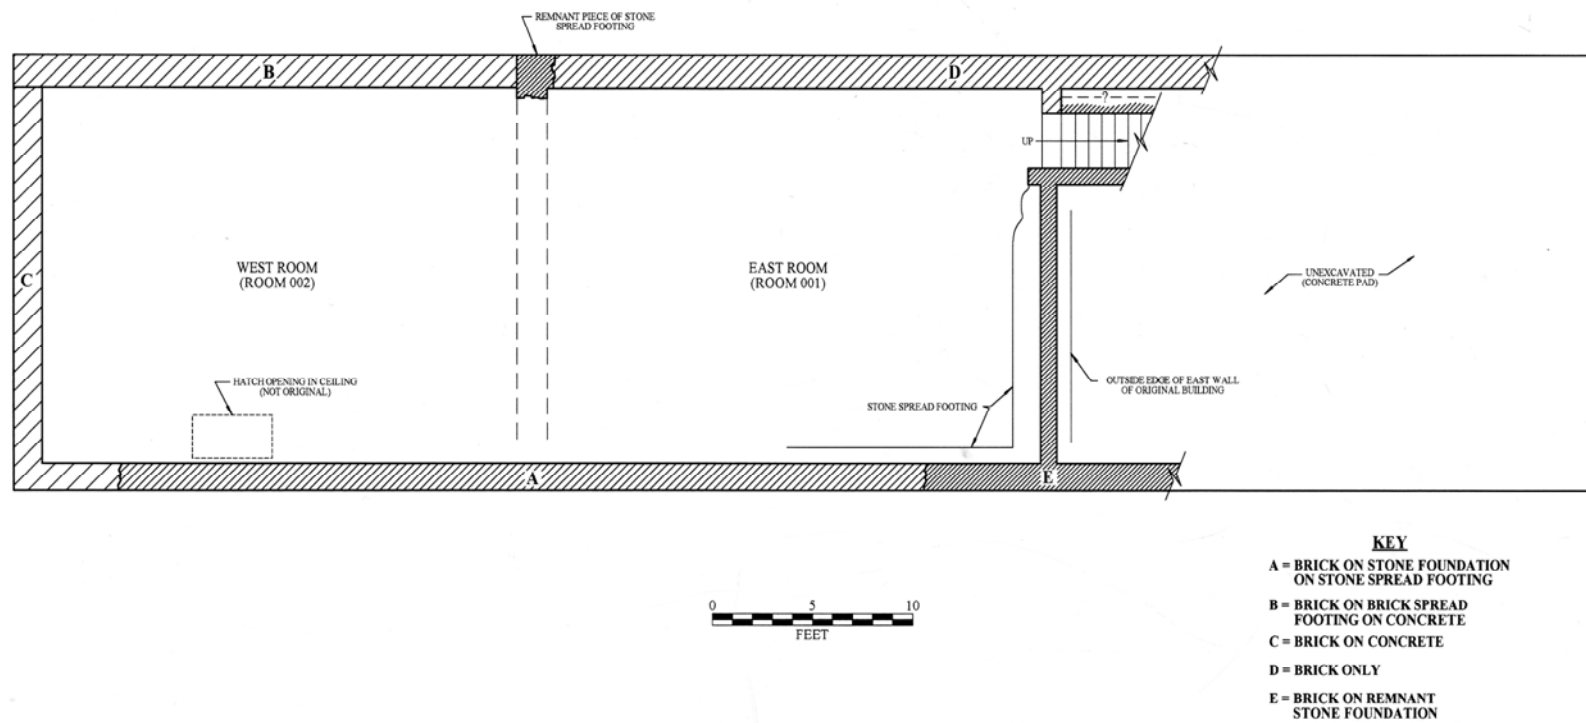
Basement plan of the Coney Island Building, showing conditions in 2000.
